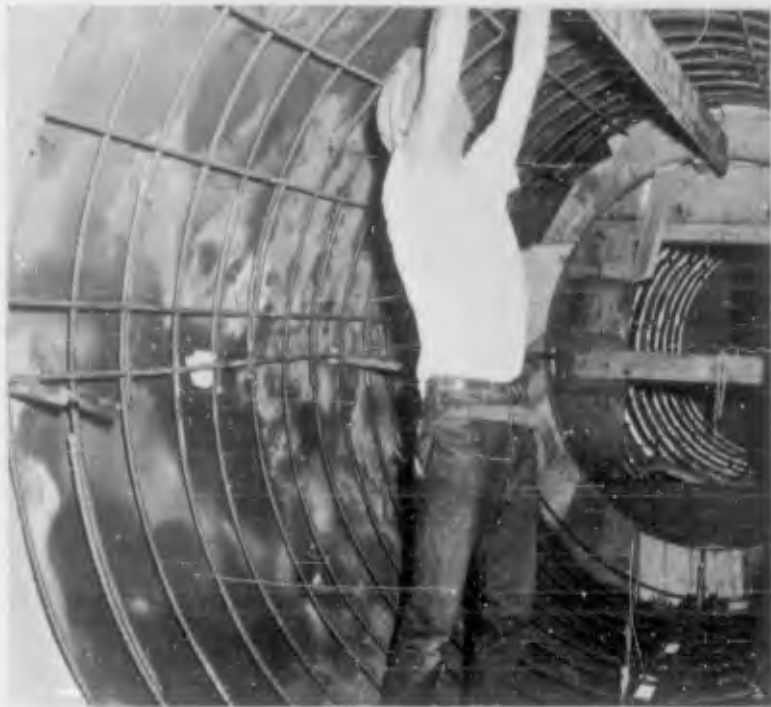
19 Installing reinforcing steel for concrete liner cast against rock. (H&N-AEC 60-788-8, 1960).
